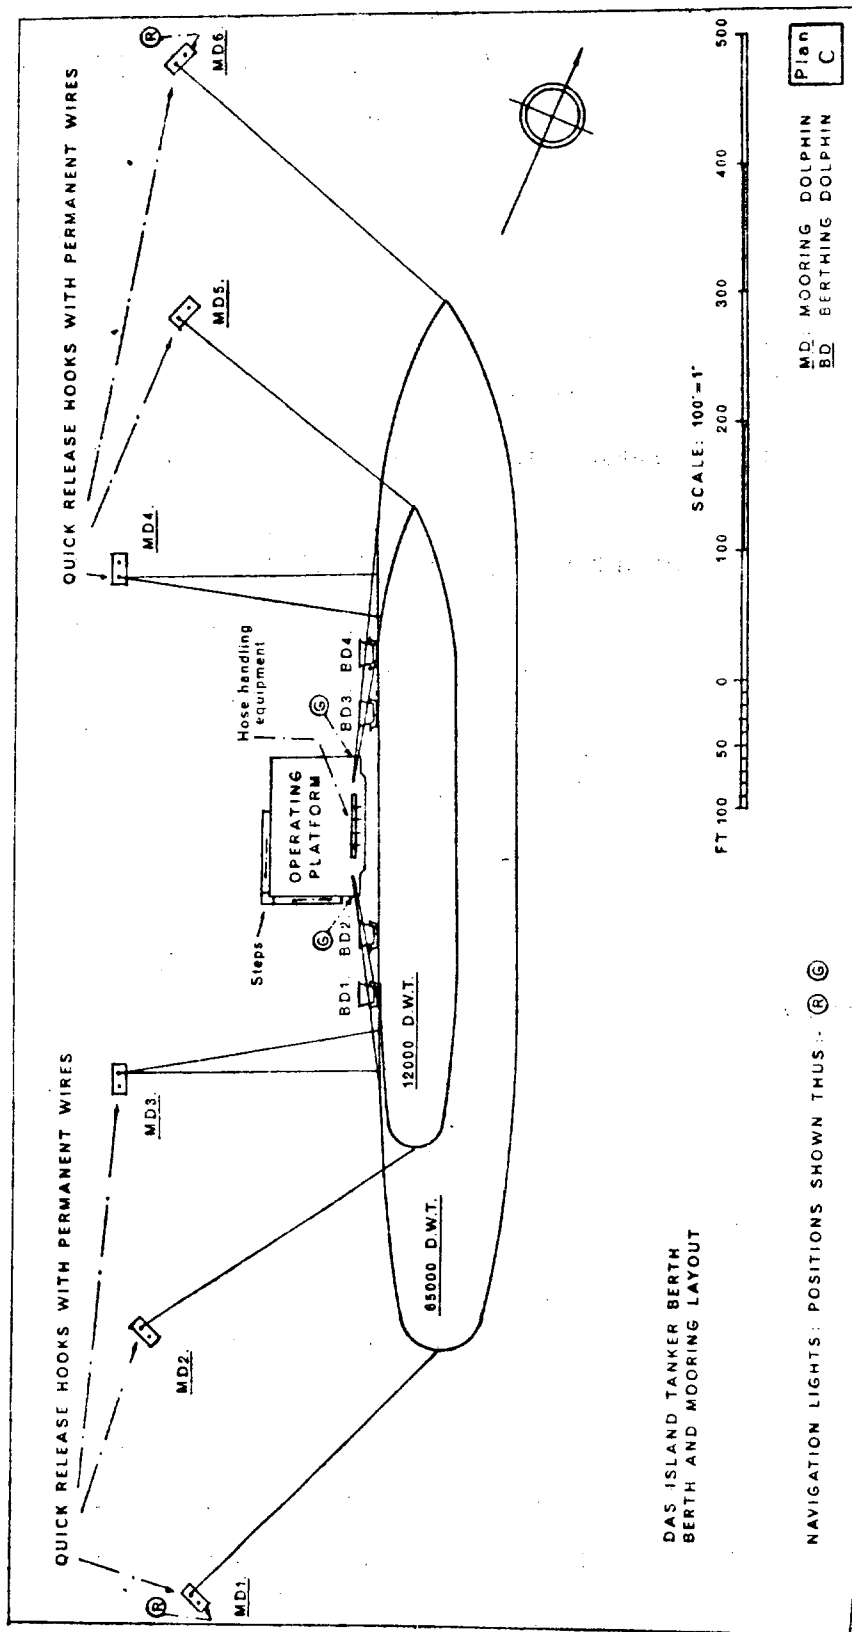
DAS ISLAND TANKER BERTH BERTH AND MOORING LAYOUT
